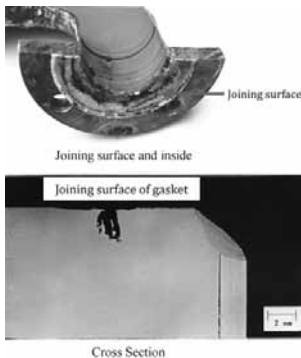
Crevice corrosion generated in flange joining surface of stainless steel piping for hot water supply, about 2 years use, 75Su(65A)
